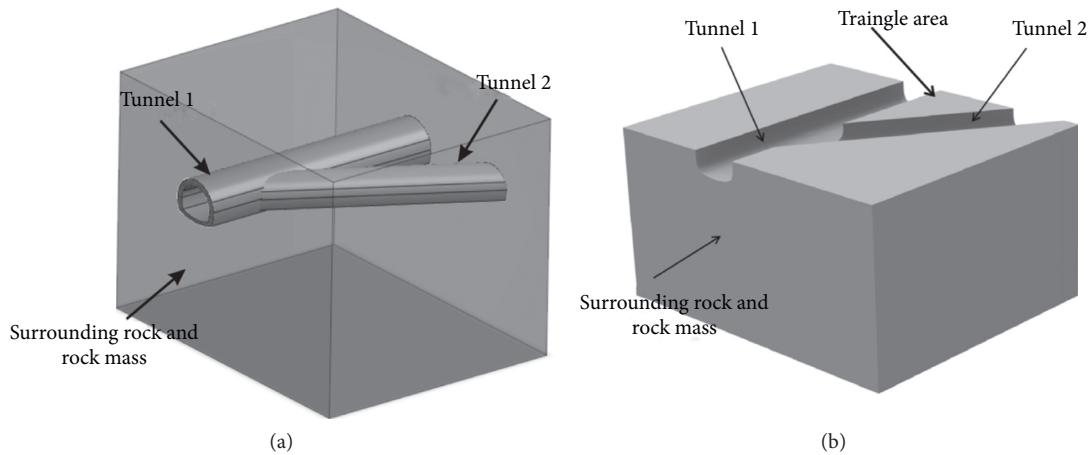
Schematic diagram of intersecting tunnels. (a) Cross tunnel. (b) Triangle area.
